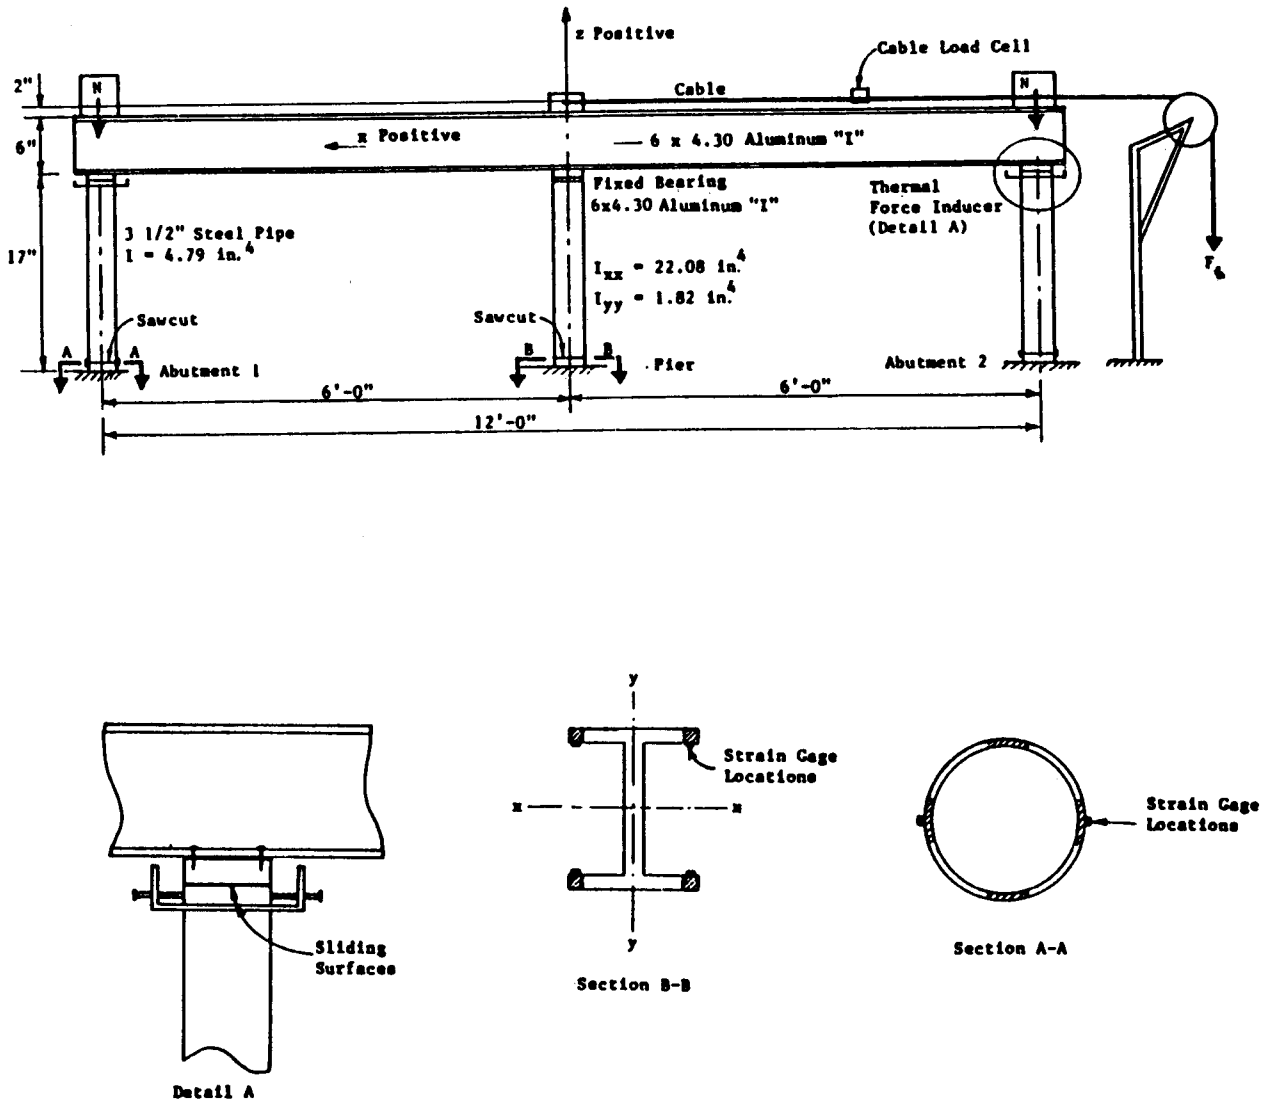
Test model structure; elevation and details (from McDermott, 1978).
